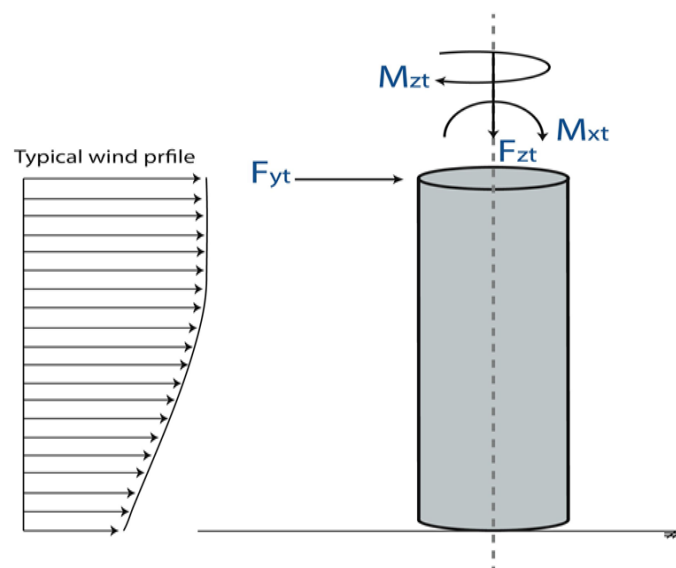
loads acting on a wind turbine supported on a pile foundation (Lombardi, Bhattacharya and Muir Wood, 2013)
